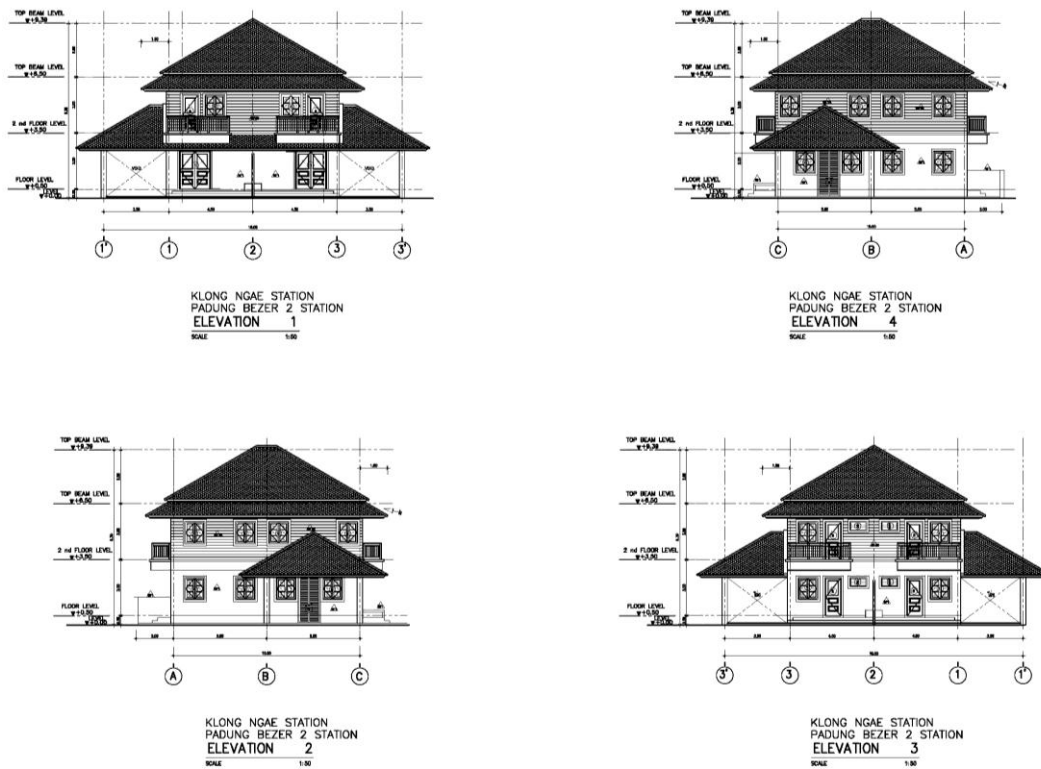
The Side View of the Staff Lodge Type A Plan, Padang Bezar 2 Station
